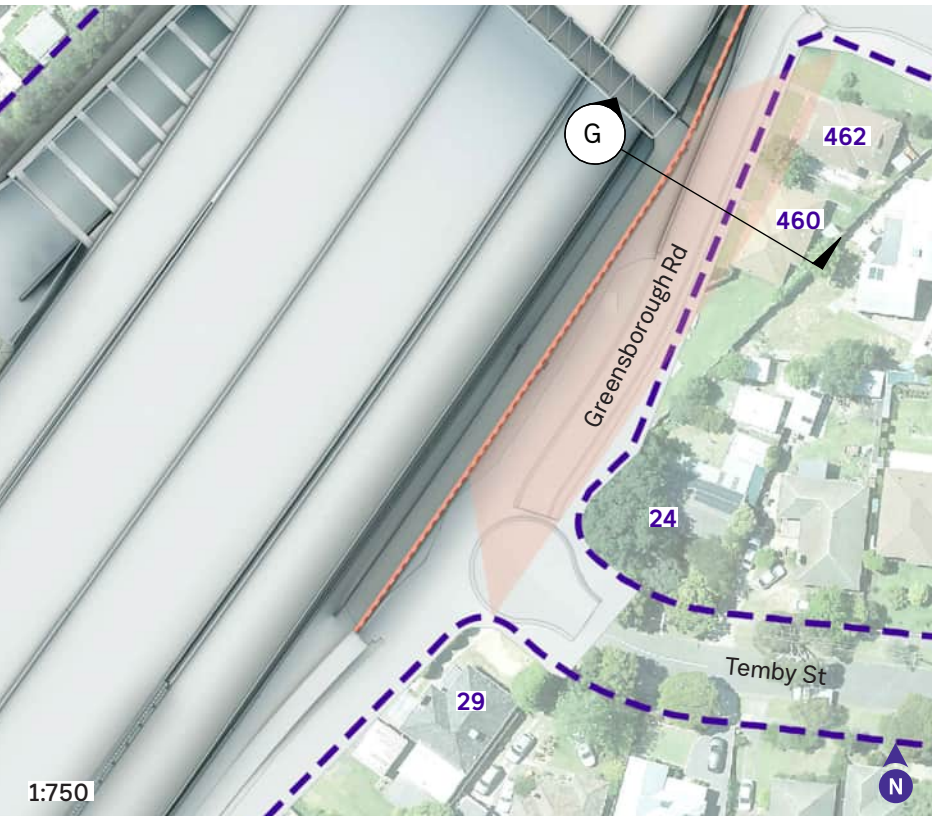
Focus Analysis: Nell Street Shared Use Path Bridge - Eastern Ramp Overlooking Analysis Plan - throw screen Type A or B application (no overlooking mitigation)
